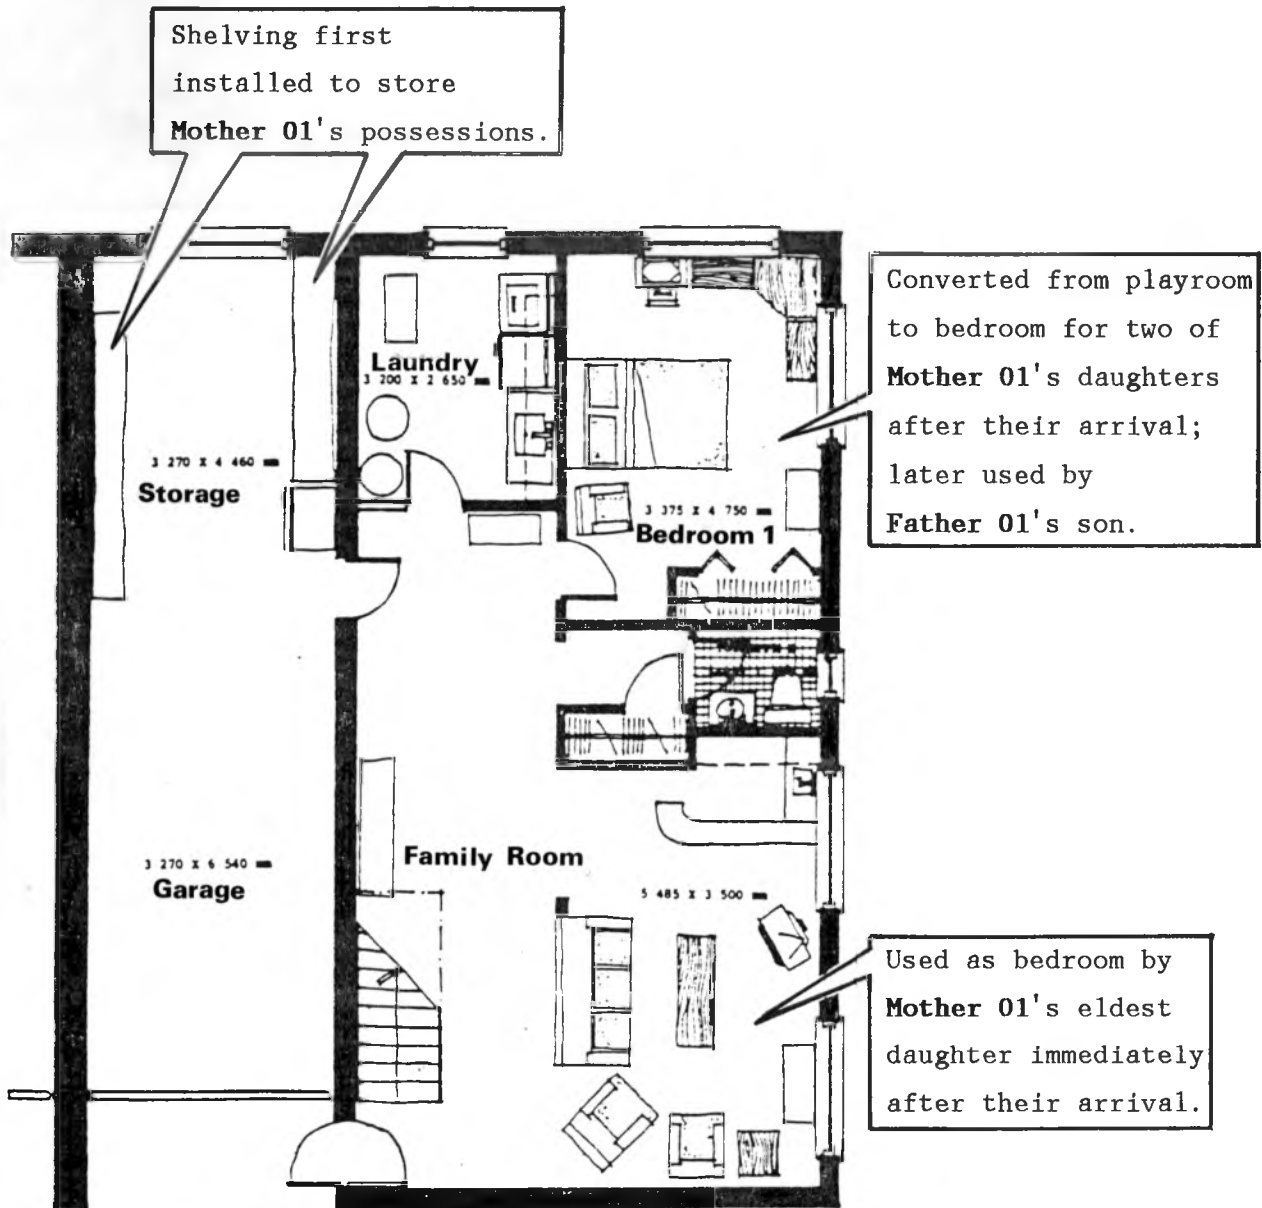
Ground floor plan, Household 01 (0170). Scale 1:100.
